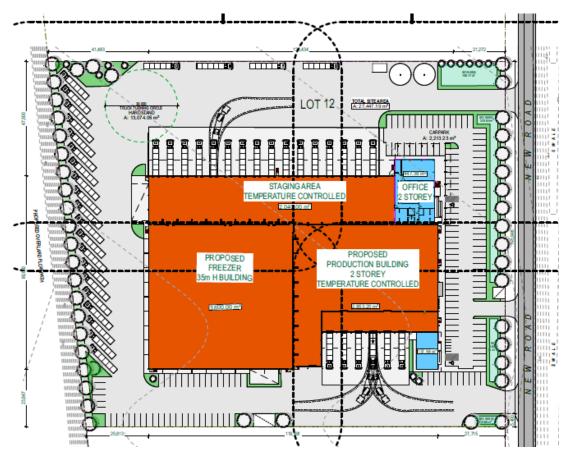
Site plan of proposed high impact industry and warehouse on Lot 12
